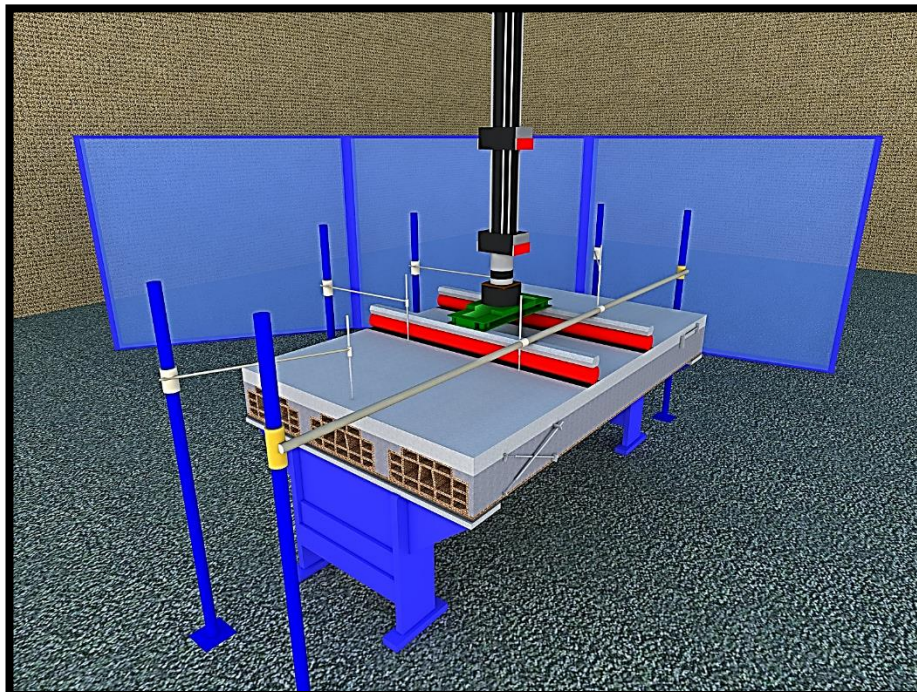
Design of the floor slab lateral view 1. (Source: Own design)
